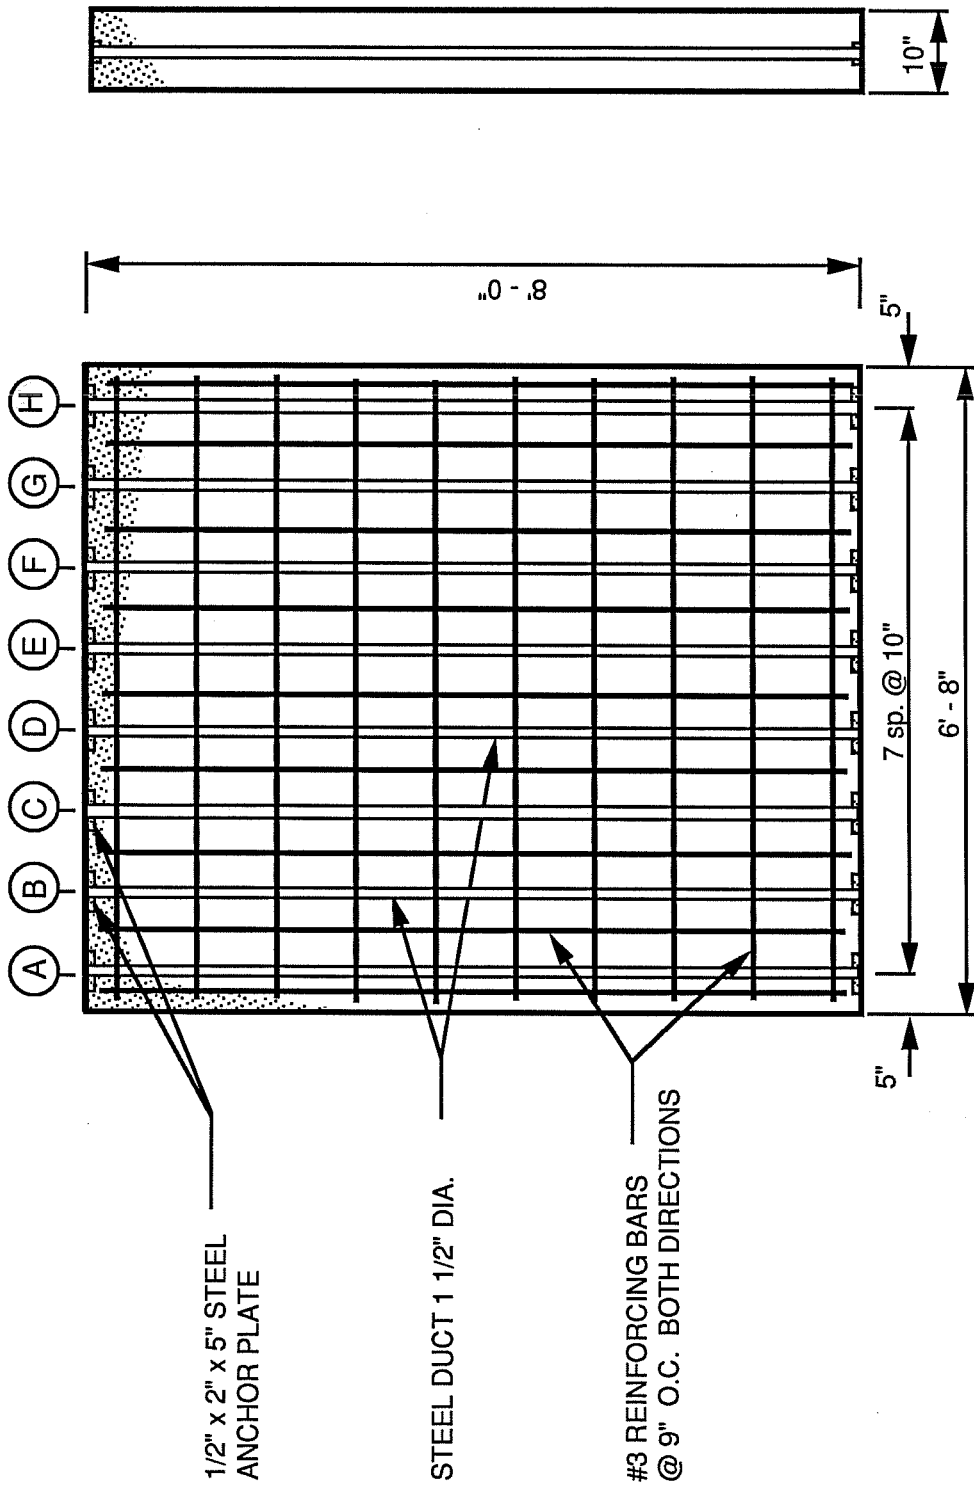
Plan of Slab #6 - Full Scale Monostrand Anchors
